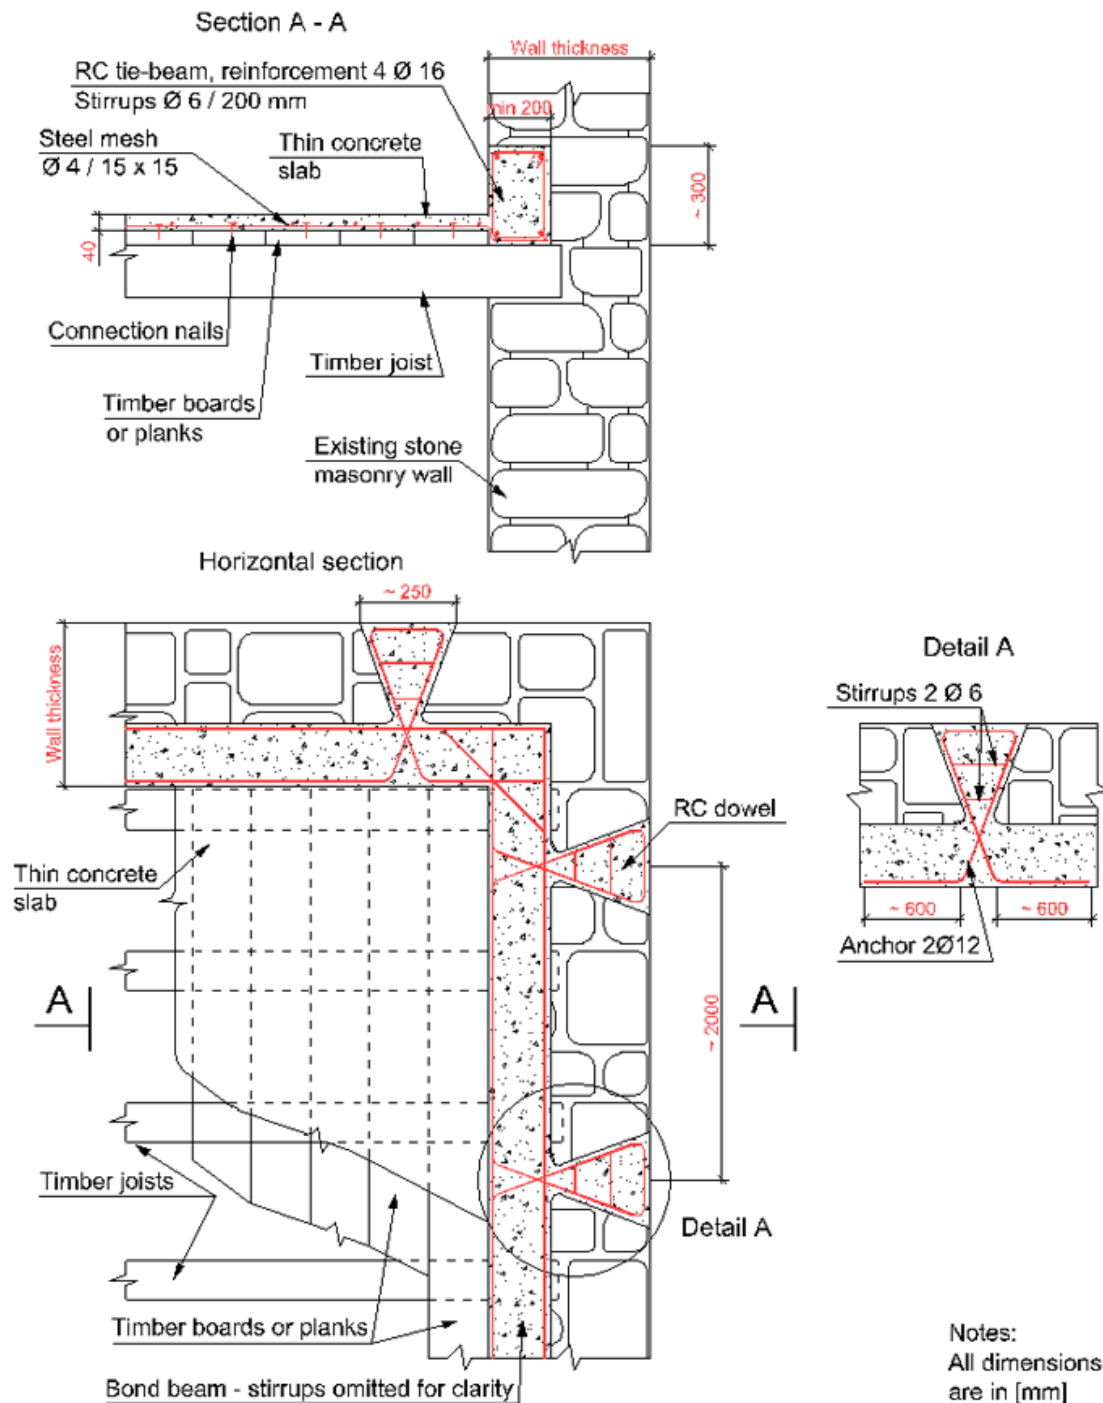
Construction of new thin RC slab and bond beam cast in situ, anchored to some masonry walls [46]
